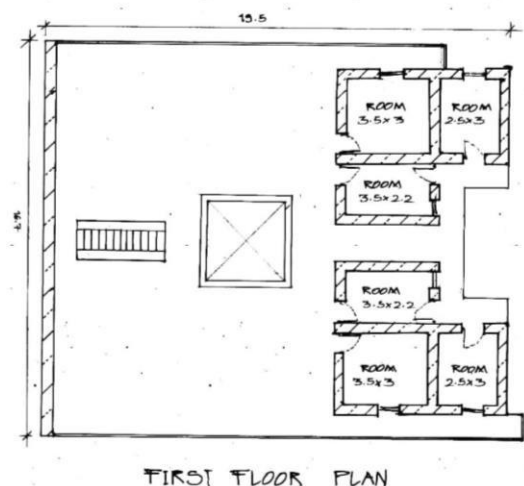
case 2 – Nagamma House first floor plan (Source: Author)
